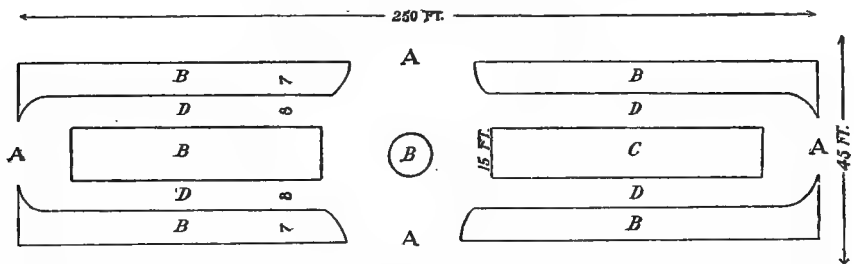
A.—Doors of canvass to loop up. B.—Beds for plants 7 feet wide. C.—Large table 2 feet high by 15 feet wide for grouping plants. D.—Pathways 8 feet wide.
